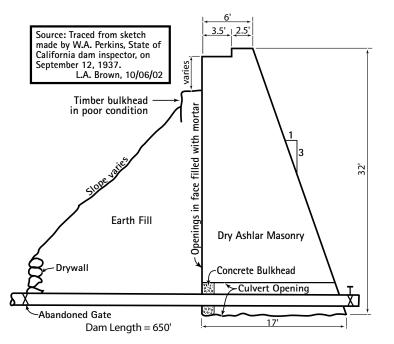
Loon Lake Dam, Maximum Section at Outlet
